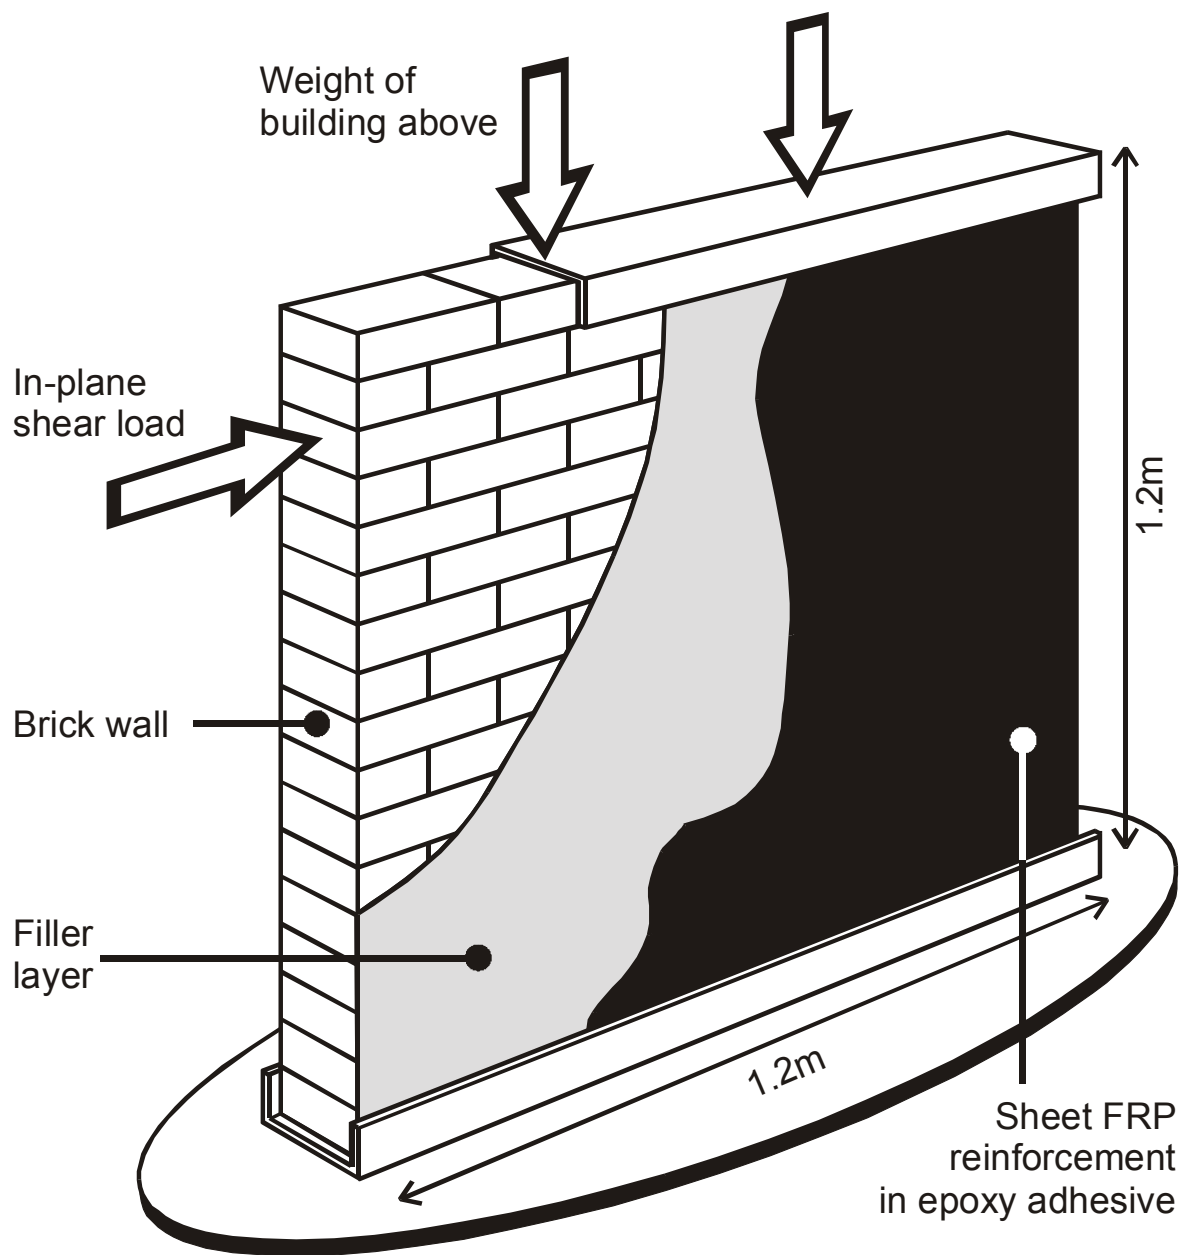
In-plane shear strengthening using sheet GFRP - schematic arrangement.
